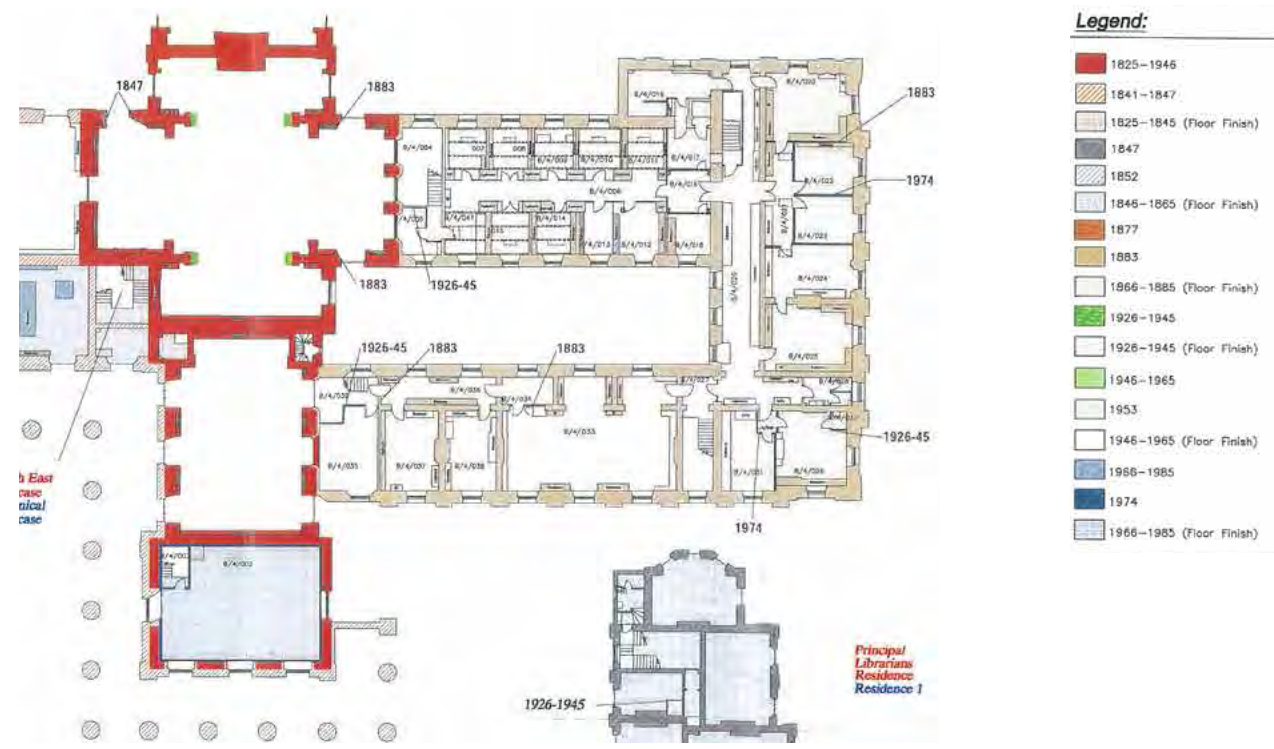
Level 04 Historical Development Plan (extract from Conservation Plan)
